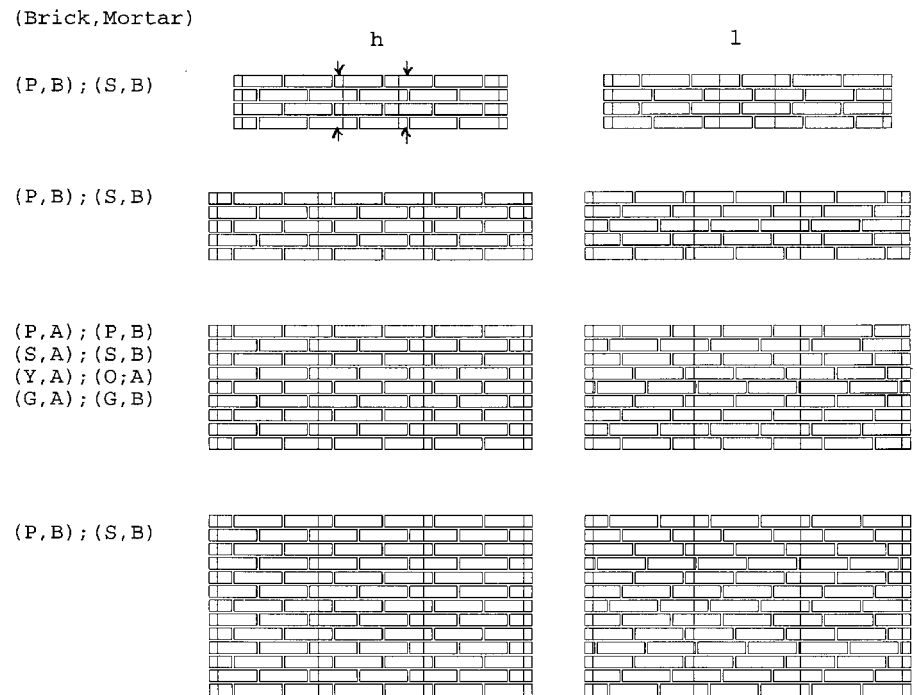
Test specimens used in bending tests about an axis normal to the bed joints.
